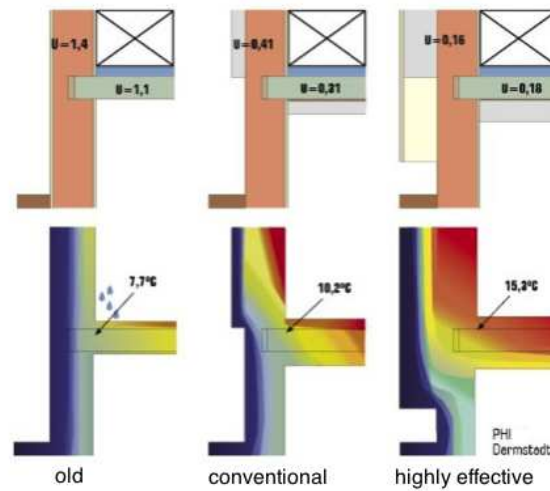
Thermal bridges at the connection of the basement ceiling and the outer wall. [35]
